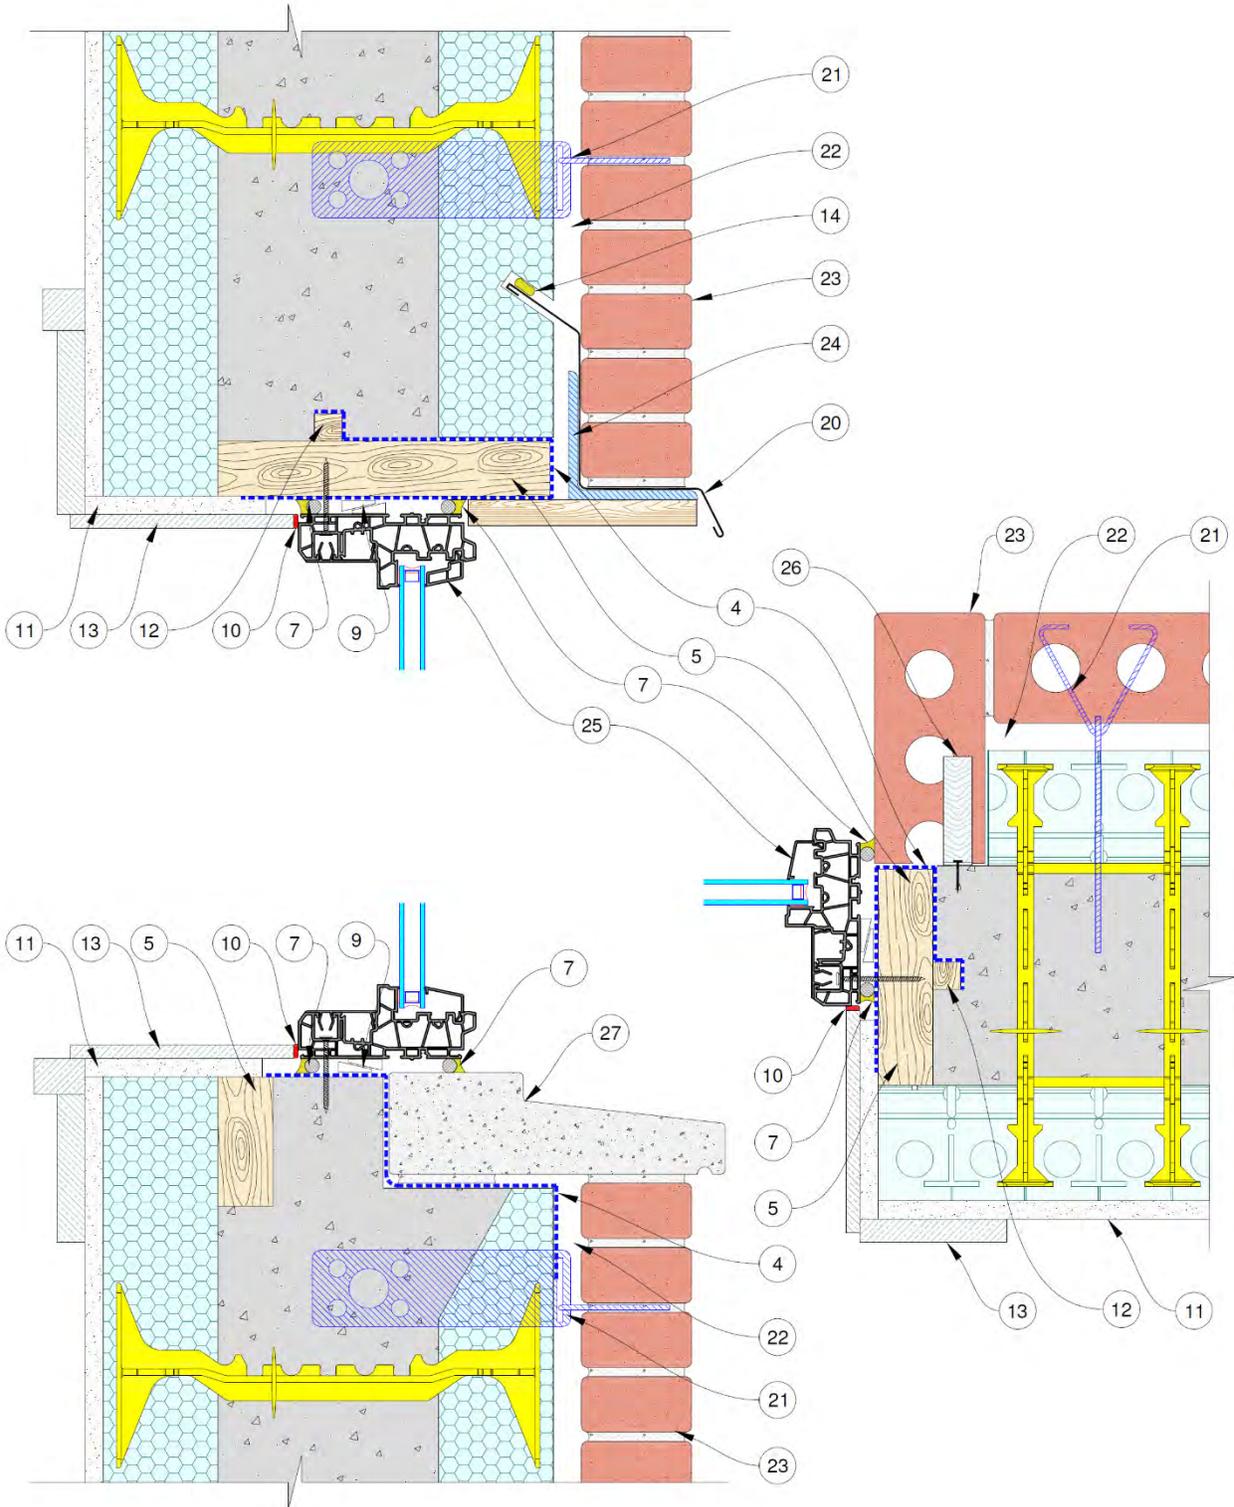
ICF Window Assembly - Wood buck-out, Boxed window centered, Brick veneer
